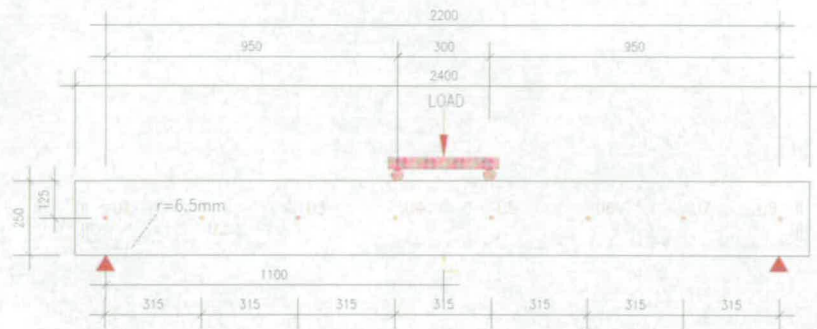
Design details, test configuration and broadband sensor location (UT-1000 type: U1 to U8) of beam KL1.
